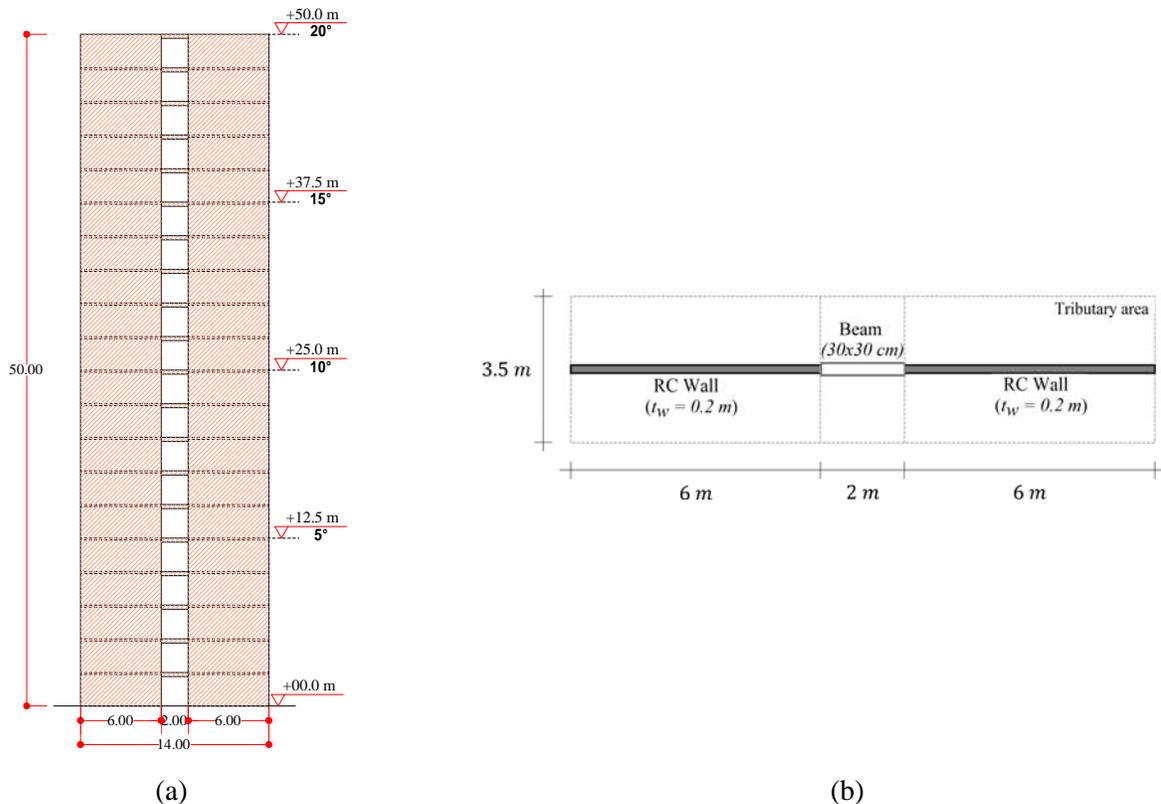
Plan and elevation views of prototype building: (a) Elevation, (b) Plan view with tributary area
